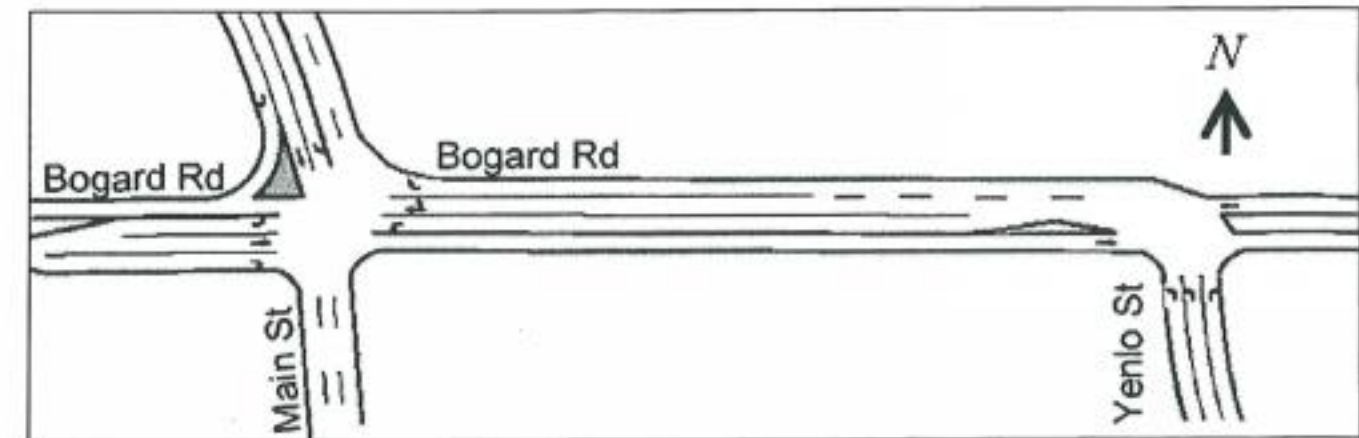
Alternative D, Final North End Connection, Minimum Lane Requirements
